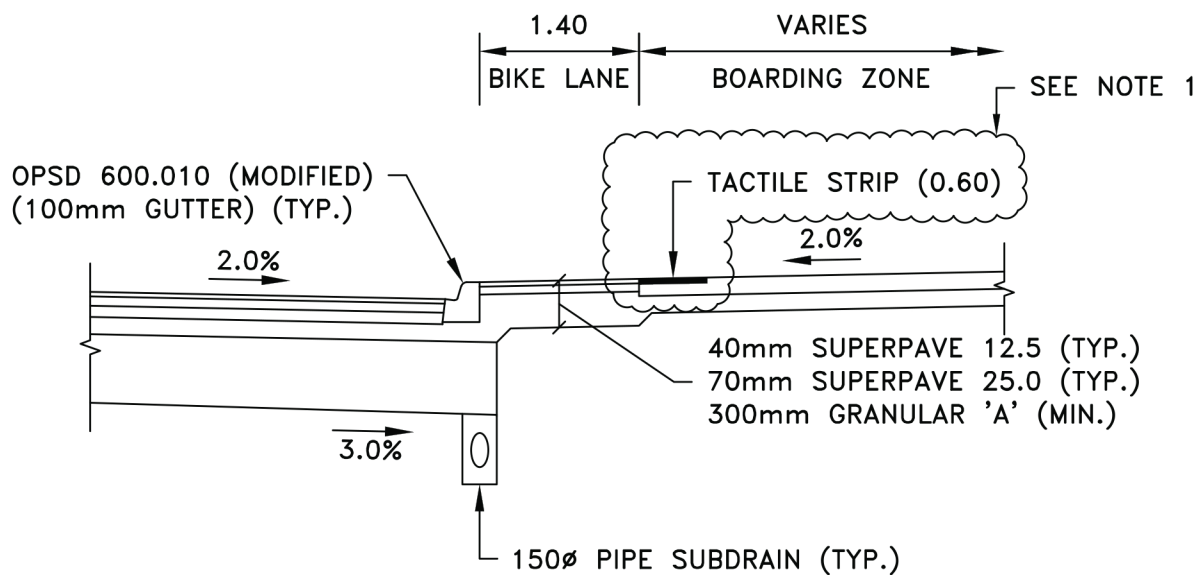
Dedicated Bikeway and Sidewalk Transit Concept
